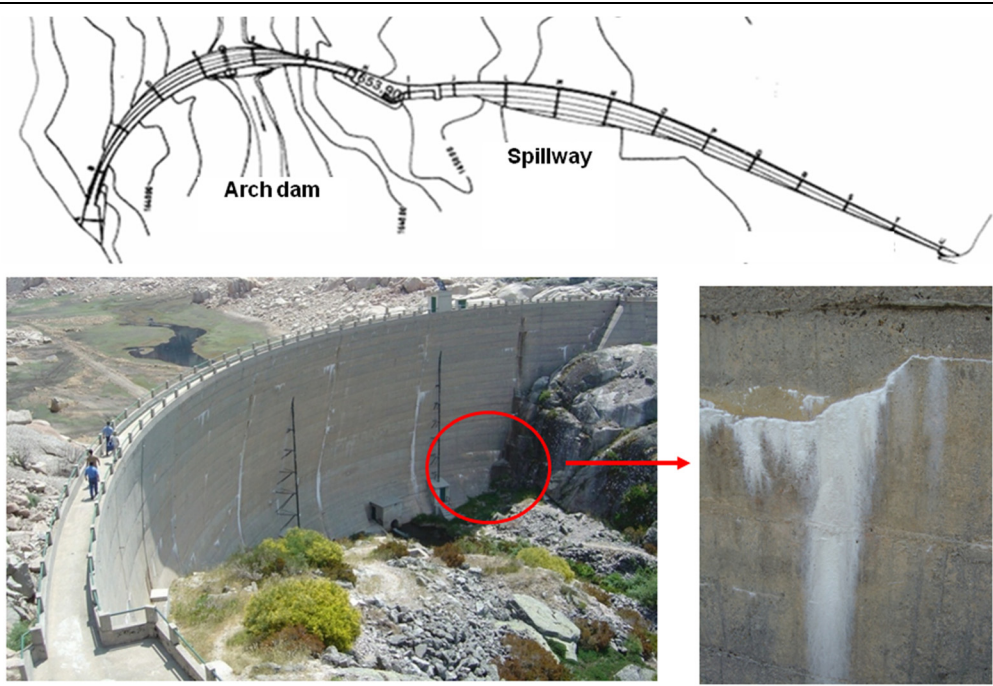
Covão do Meio dam. Plan, general downstream view of the arch dam and detailed view of the cracks on the downstream surface, parallel to the foundation insertion.
